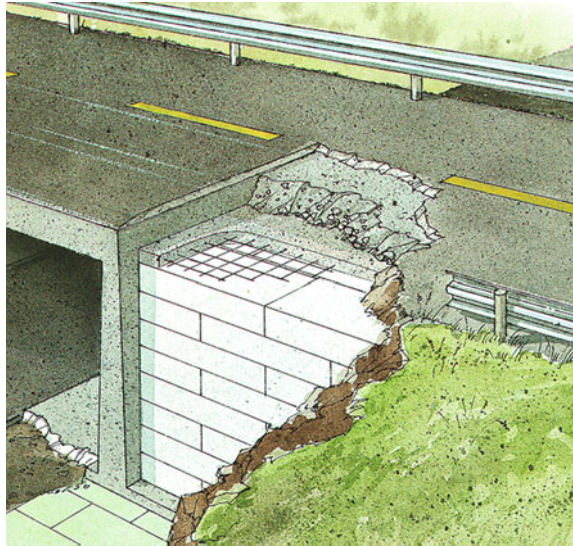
Abutment for multispan concrete bridge founded directly on geofaom blocks with varying compressive strength (NPRA)
